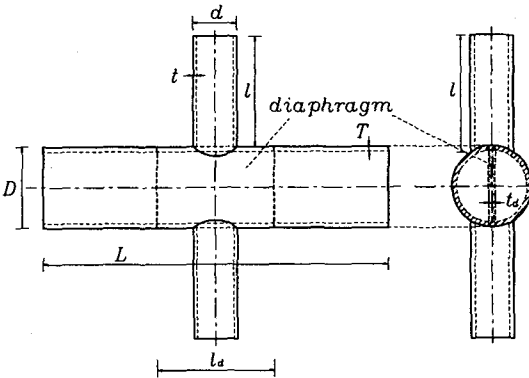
Dimensions of longitudinal diaphragm stiffened tubular X-joint.
